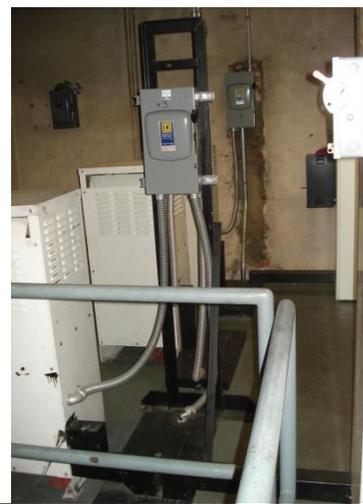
Upper Elevator Machine Room; another view of various electrical and control equipment boxes.
